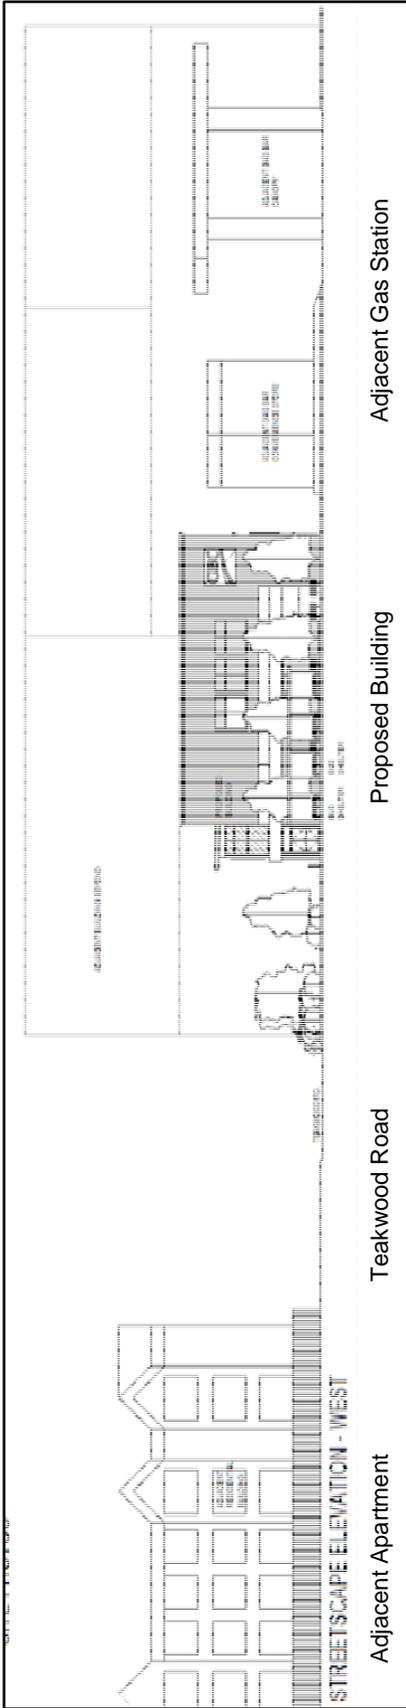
Streetscape of Proposed Commercial Building (Provided by Stantec Architecture Ltd.)
